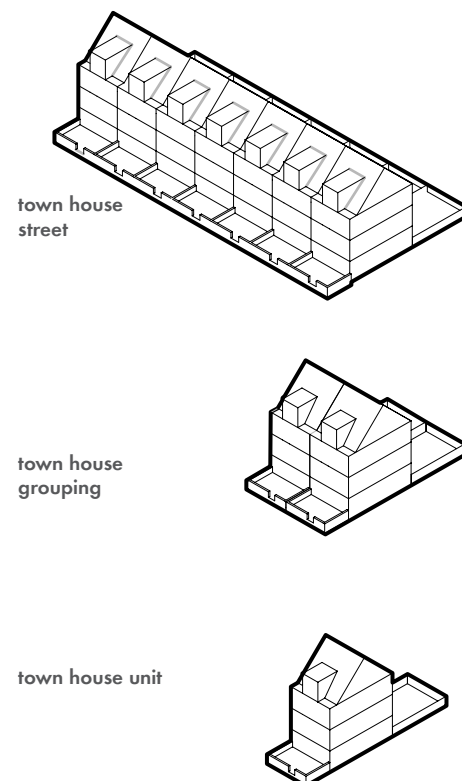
Diagram to illustrate a town house as a single unit, repeated to form a group or street terrace
